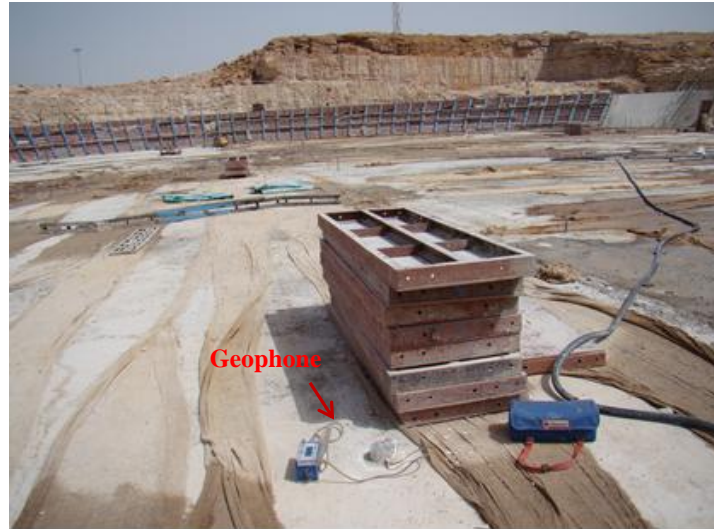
Monitoring of ground vibration on the concrete floor of RB7
